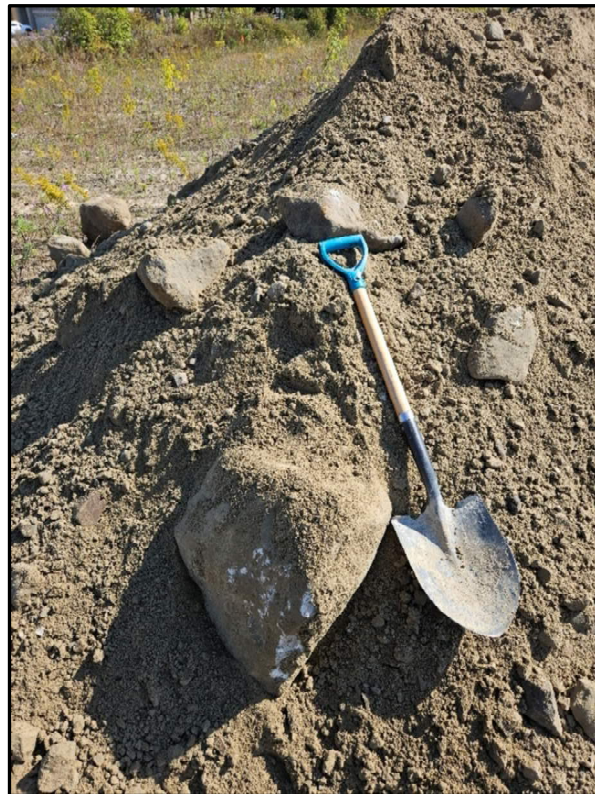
Photo illustrating the boulders excavated from the test pit TP 8-24.
